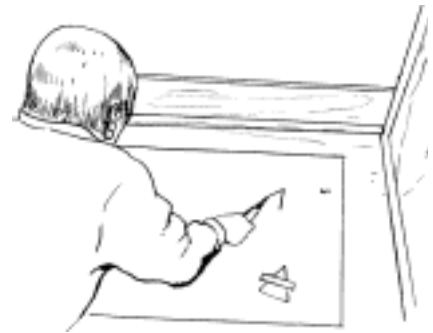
Fastening parallel strips of felt with triangular pieces.
